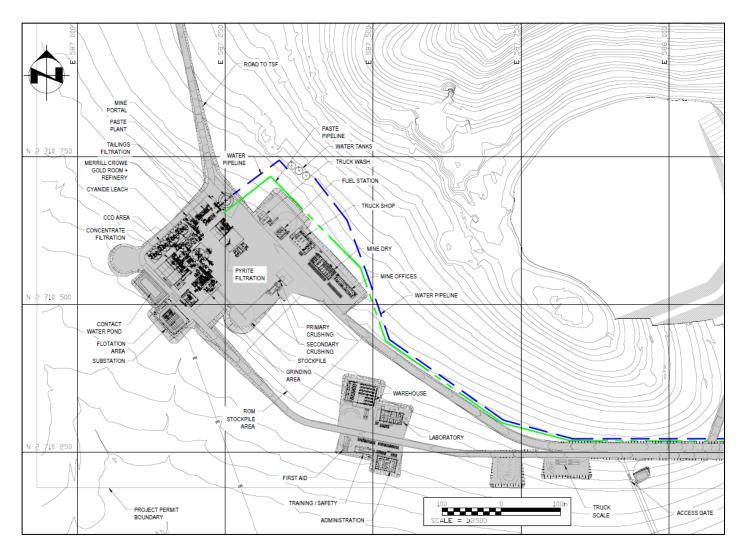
Proposed Location of the Processing Plant and Other Buildings
